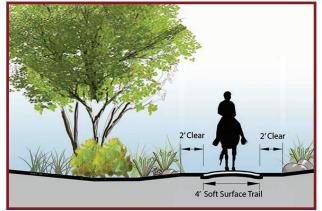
Typical Footpath/Equestrian Trail Cross Section
